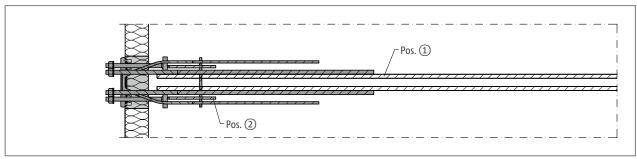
Schöck Isokorb® T type SK-M1: On-site reinforcement: Plan view
